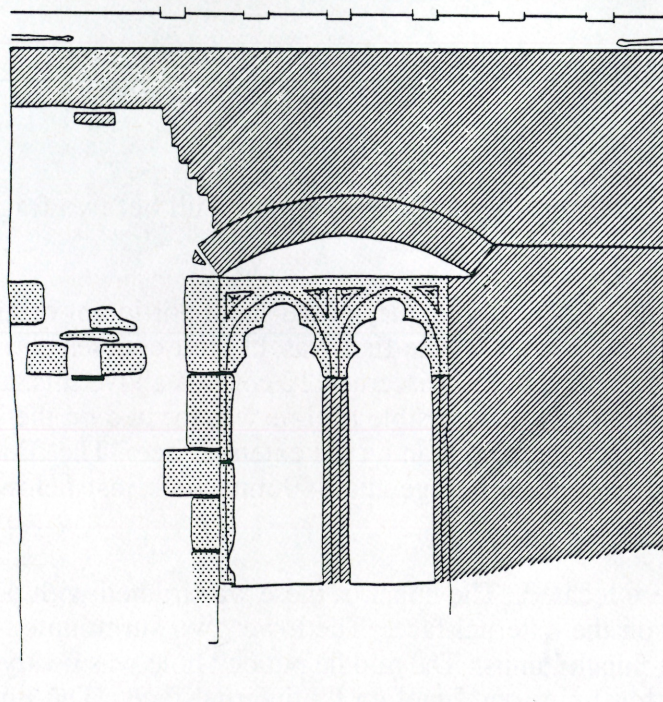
South wall internal elevation (Drawing by A. Baggs)
